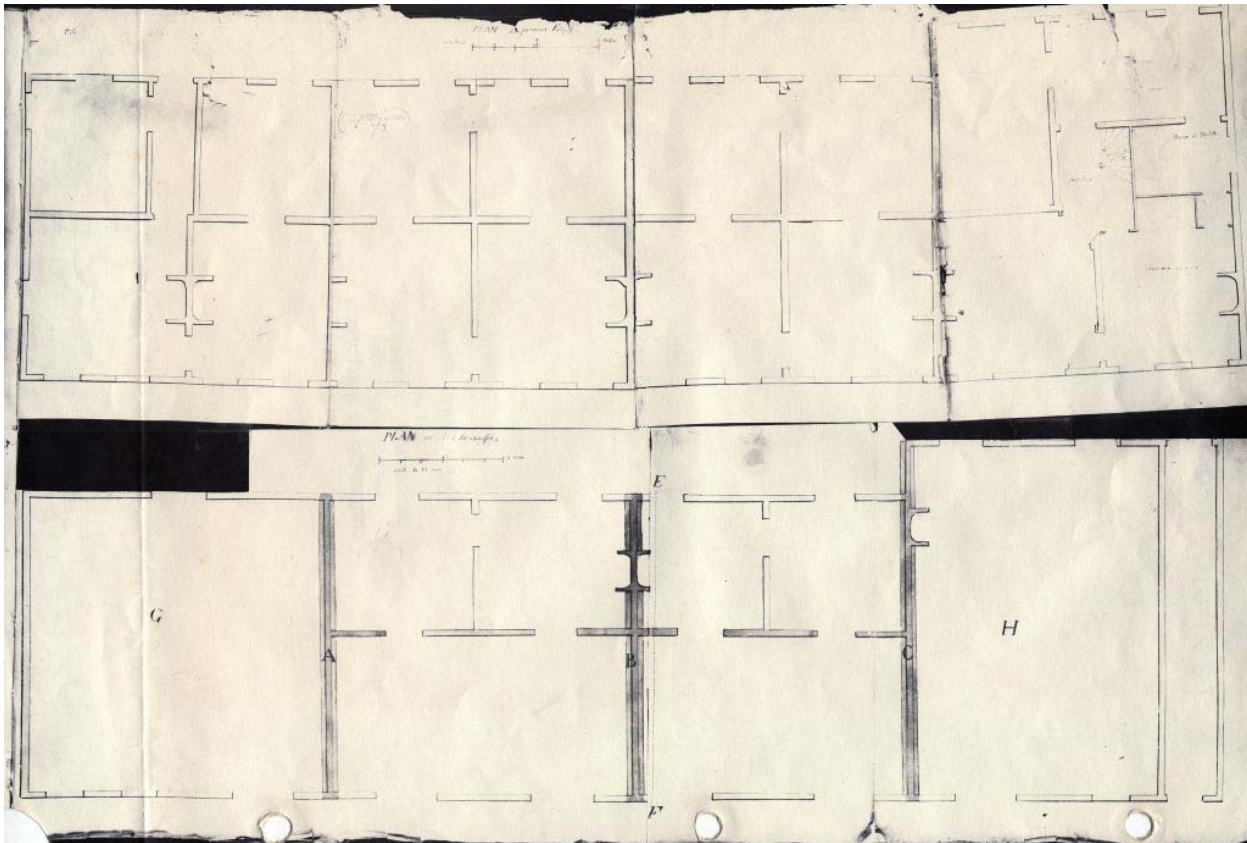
Florplans by Barthelémy Lafon for a house for Mlle. Macarty, to be built at 401 Decatur Street (corner Conti), in 1794. The lower set of rooms are for the ground floor shops, while the upper set are the living rooms of the house set on the second level. The plan is subtly semi-double. Courtesy the Louisiana State Museum, Spanish Colonial Records No. 3361.
